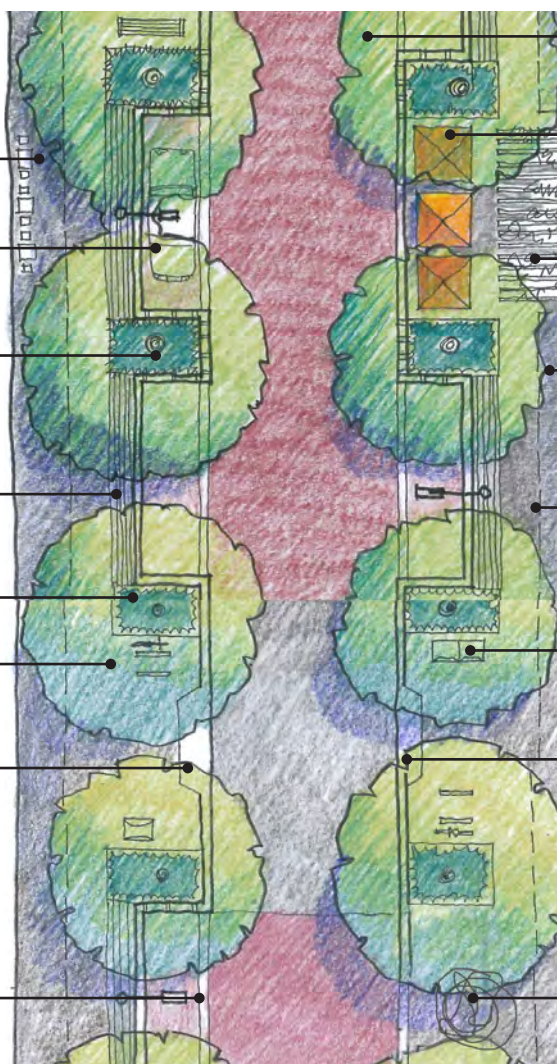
Indicative Plan and Section Urban Street - Ellen Stirling Boulevard
